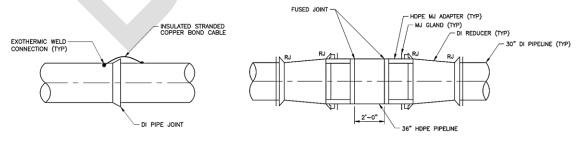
Bonded Joints and Electrical Isolation Detail
